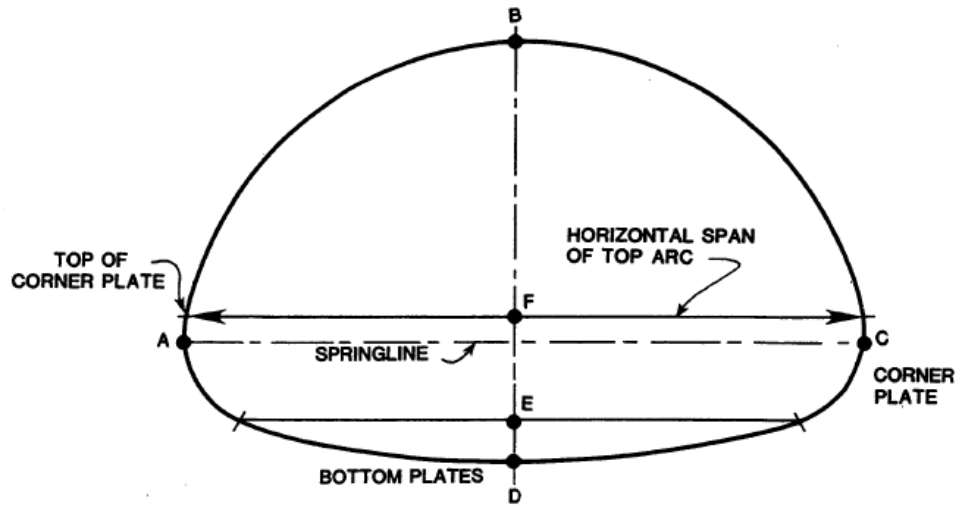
(Exhibit 84) Bottom and Corners of this Pipe Arch have Settled
